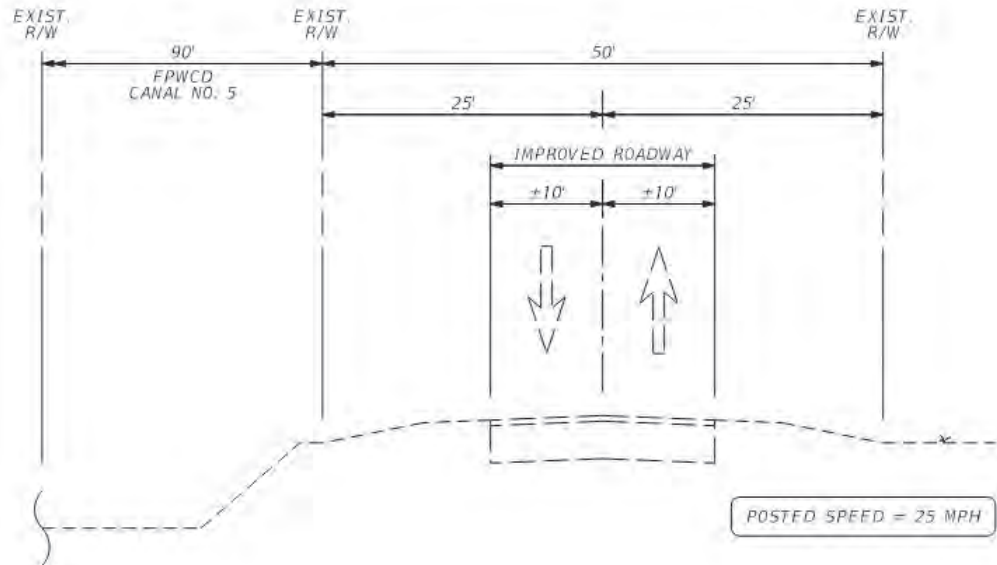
D: Seminole Road Existing Typical Section – South of Immokolee Road
